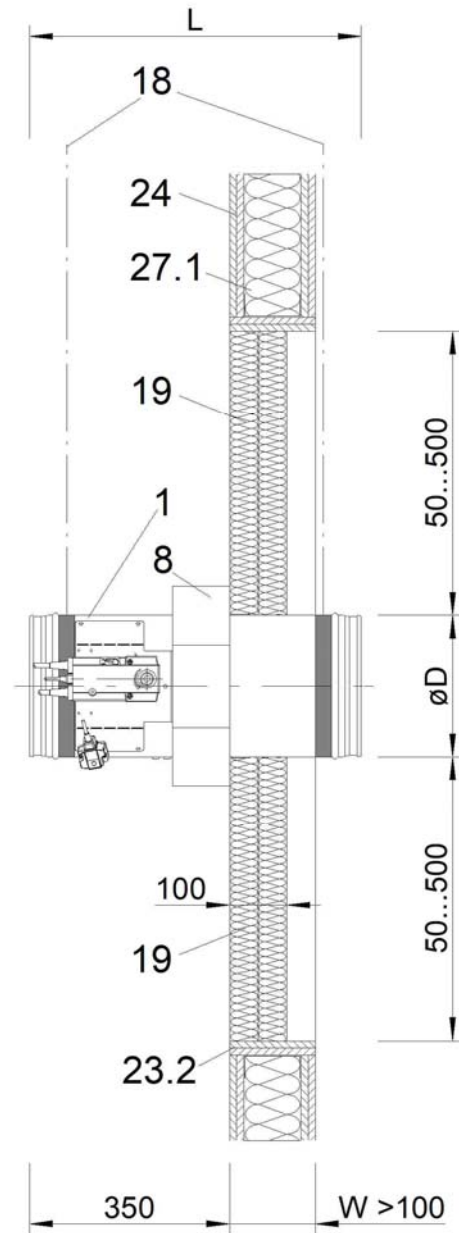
Installation in metal post wall (wall thickness > 100 mm)
